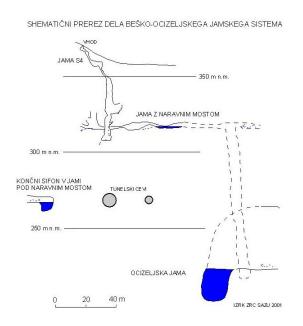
Planning of the railway tunnel in the area of the large cave system.
